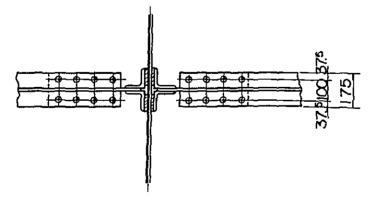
IMPROVEMENT AND DISSOLUTION OF CONSTRUCTION JOINT
